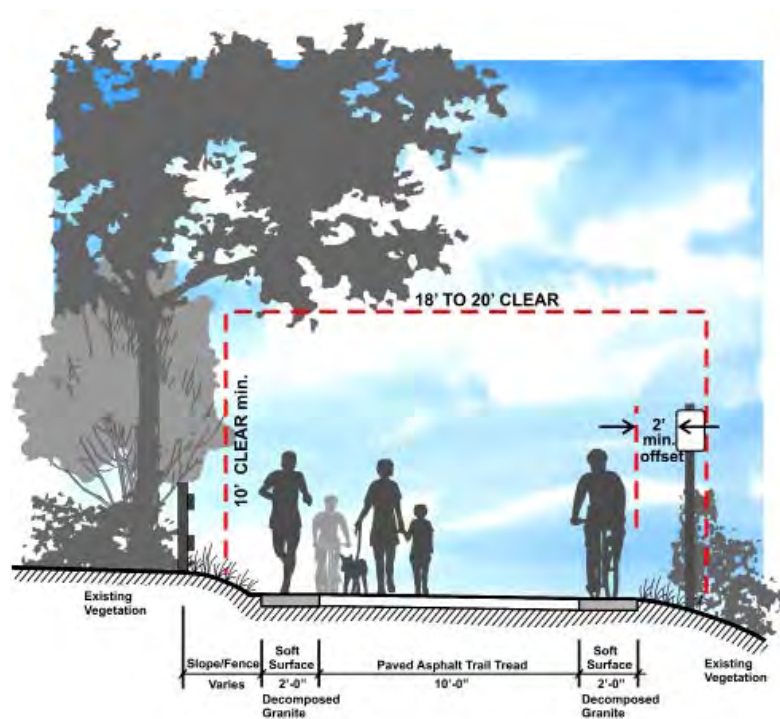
B: Type A Trail (Asphalt Paved Surface)
